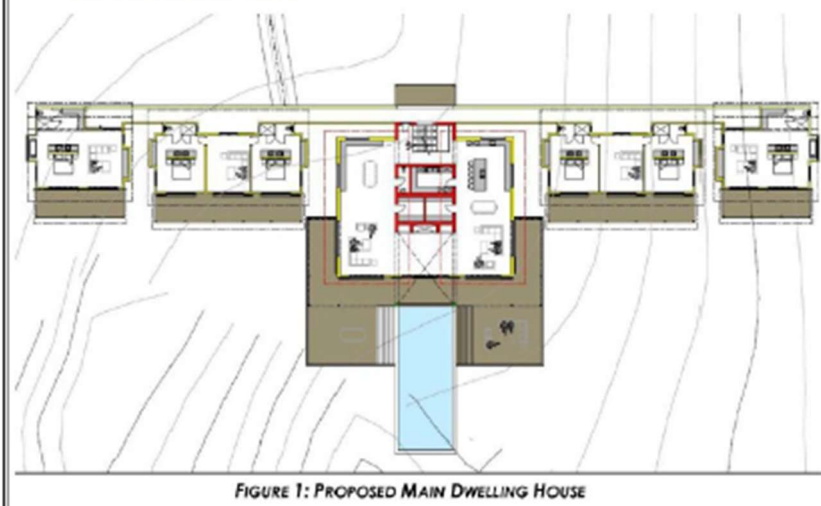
PROPOSED MAIN DWELLING HOUSE
